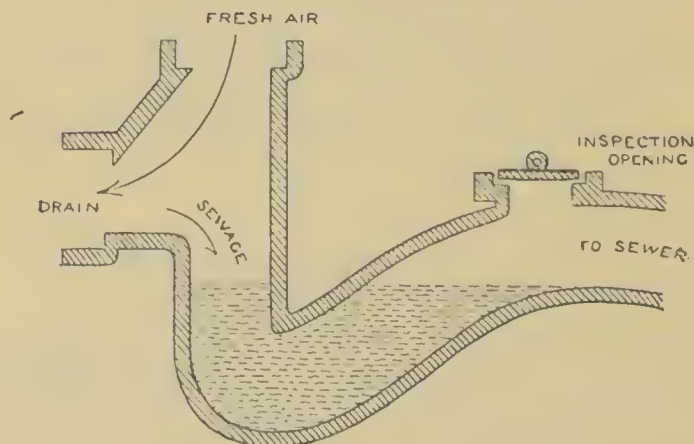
BUCHAN'S DISCONNECTING AND VENTILATING TRAP.
